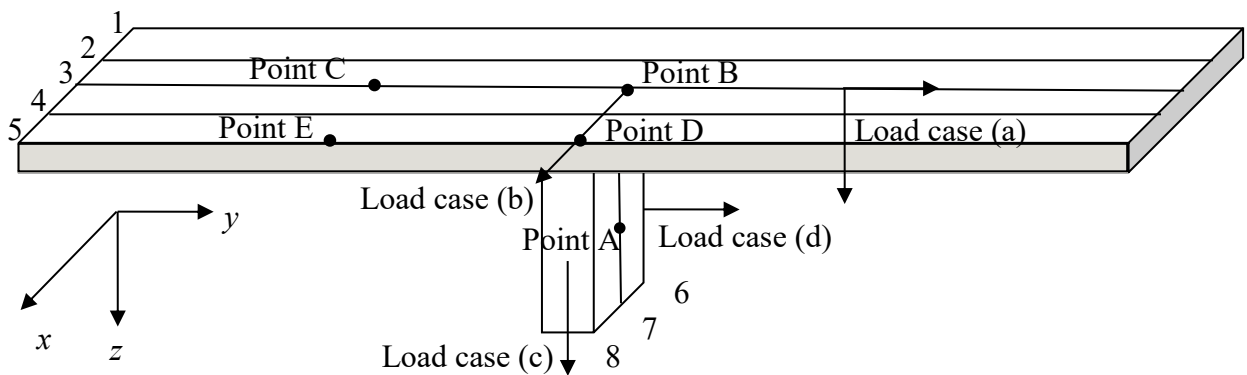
A Simple Slab Bridge: Structural Layout (Shen et al. 2013)
